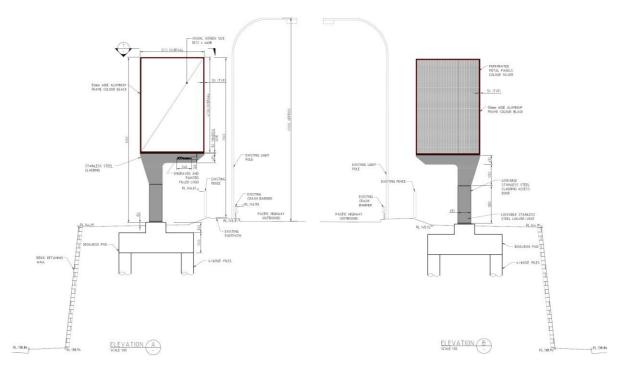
| Front and back elevations of the proposed signage (Source: Applicant's documentation)
